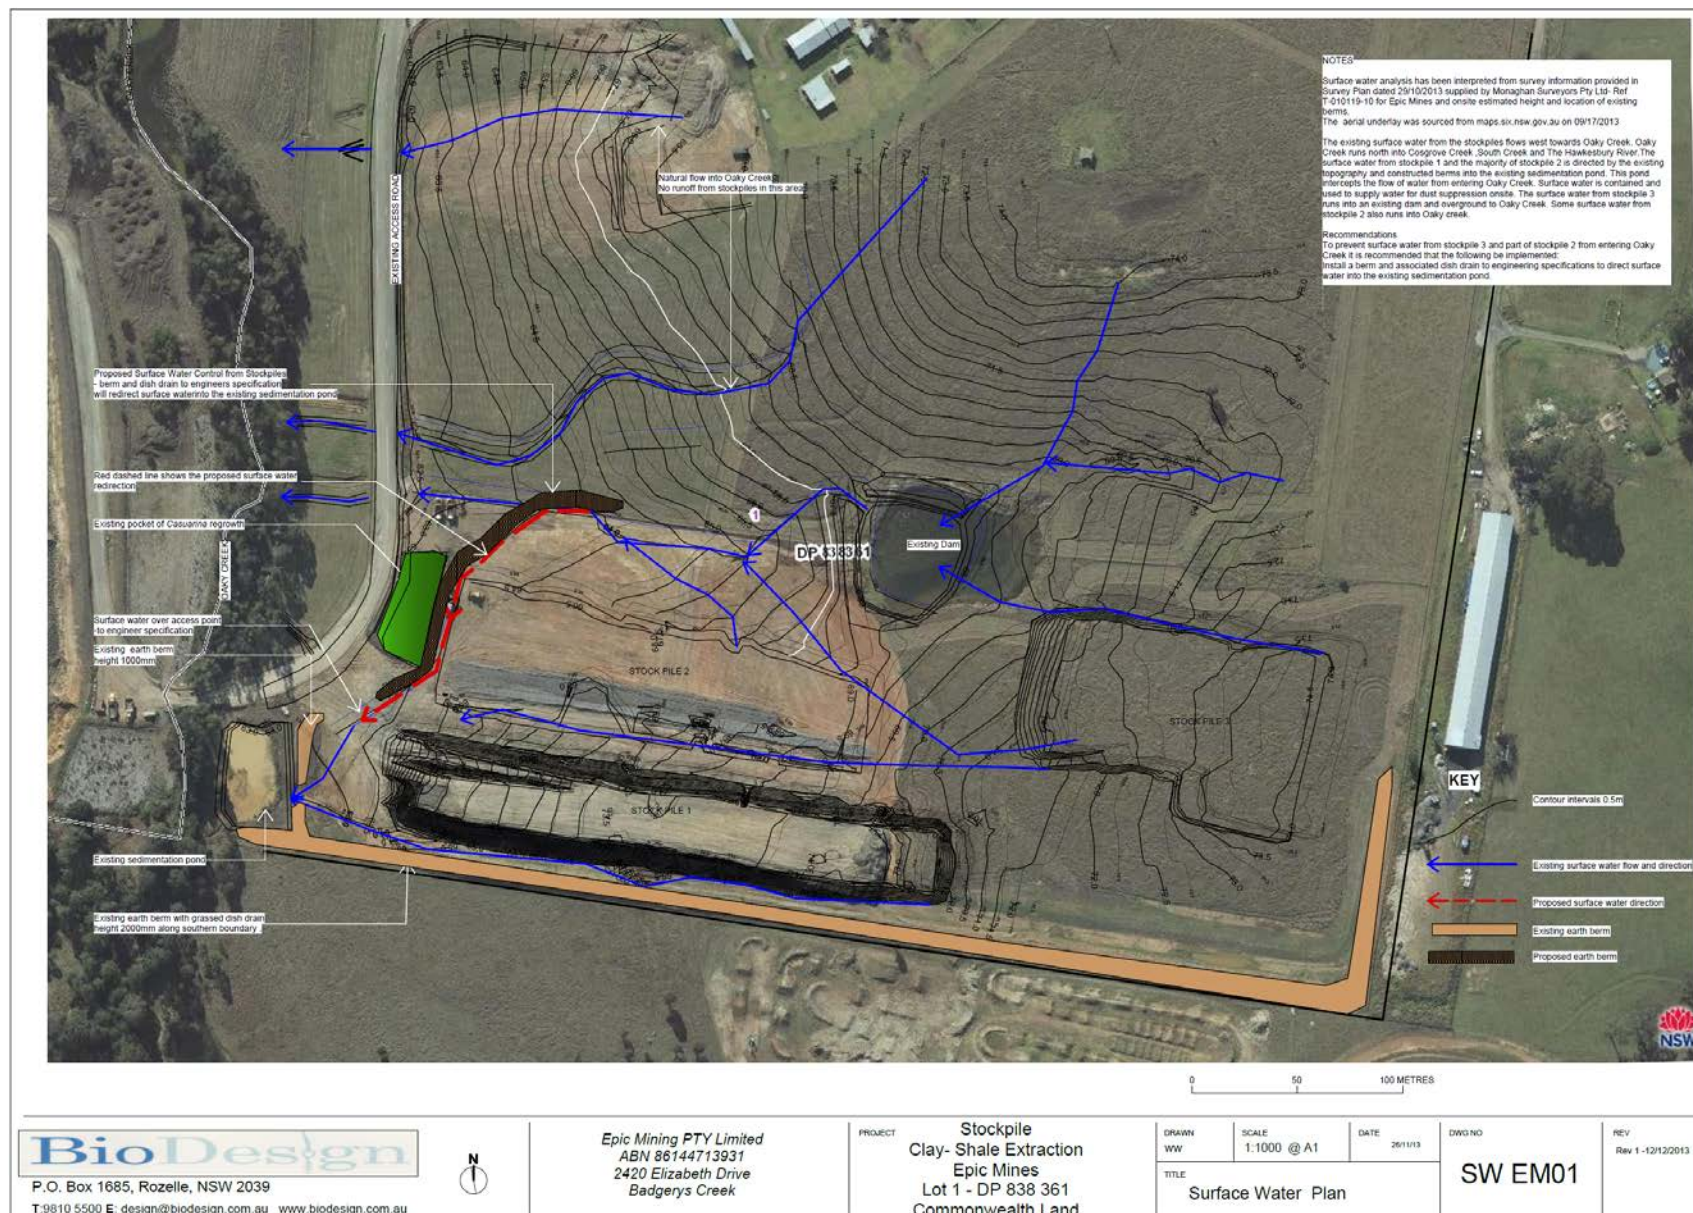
Proposed Water Management Plan – Commonwealth-owned Land
